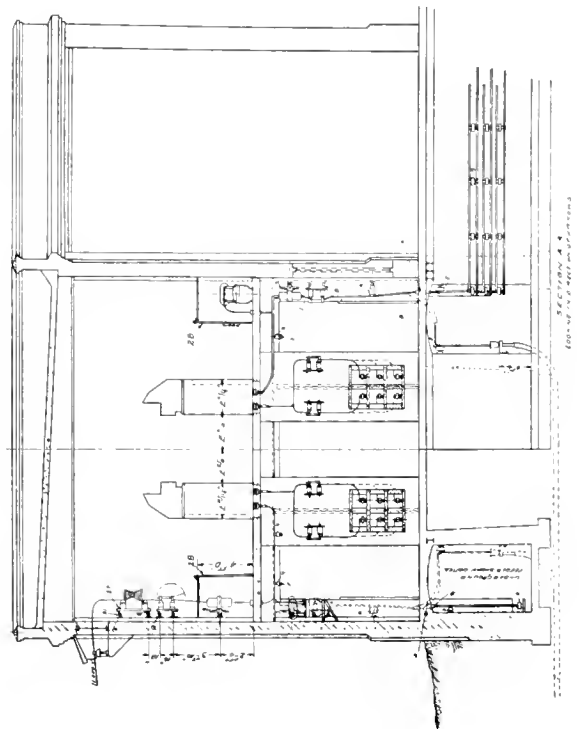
Sectional Elevation of Building, Atlanta Substation
